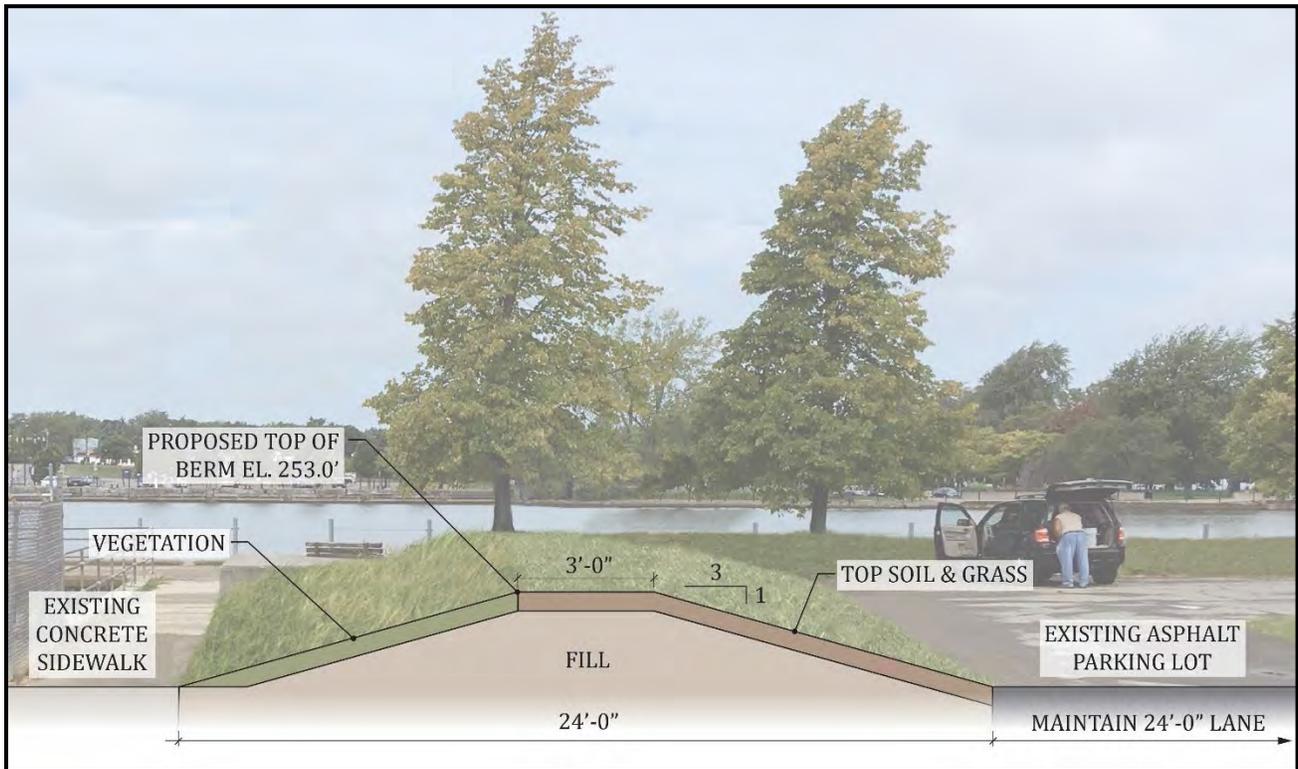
Section of Proposed Berm Structure at NYS-DEC Fishing Access Area - Vegetation
